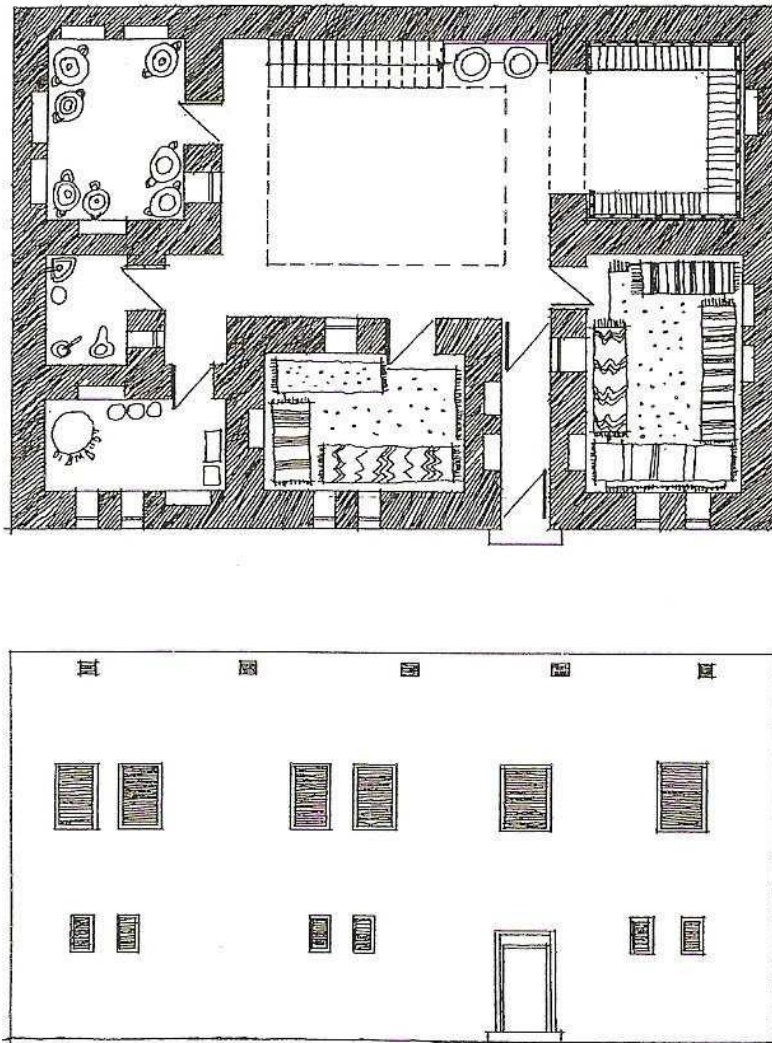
Plan and elevation of typical house in the citadel of Erbil
